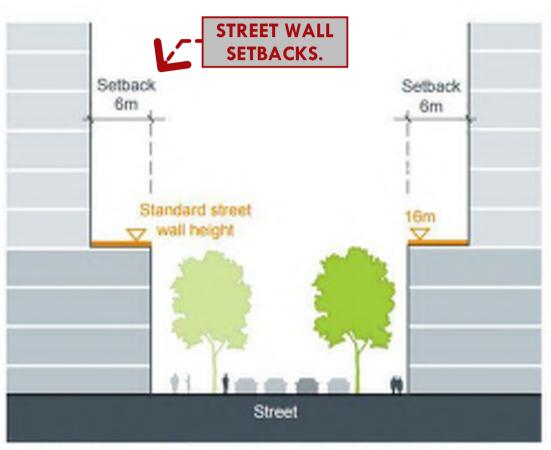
Section showing the typical 16m street wall height and typical 6m upper level setback
